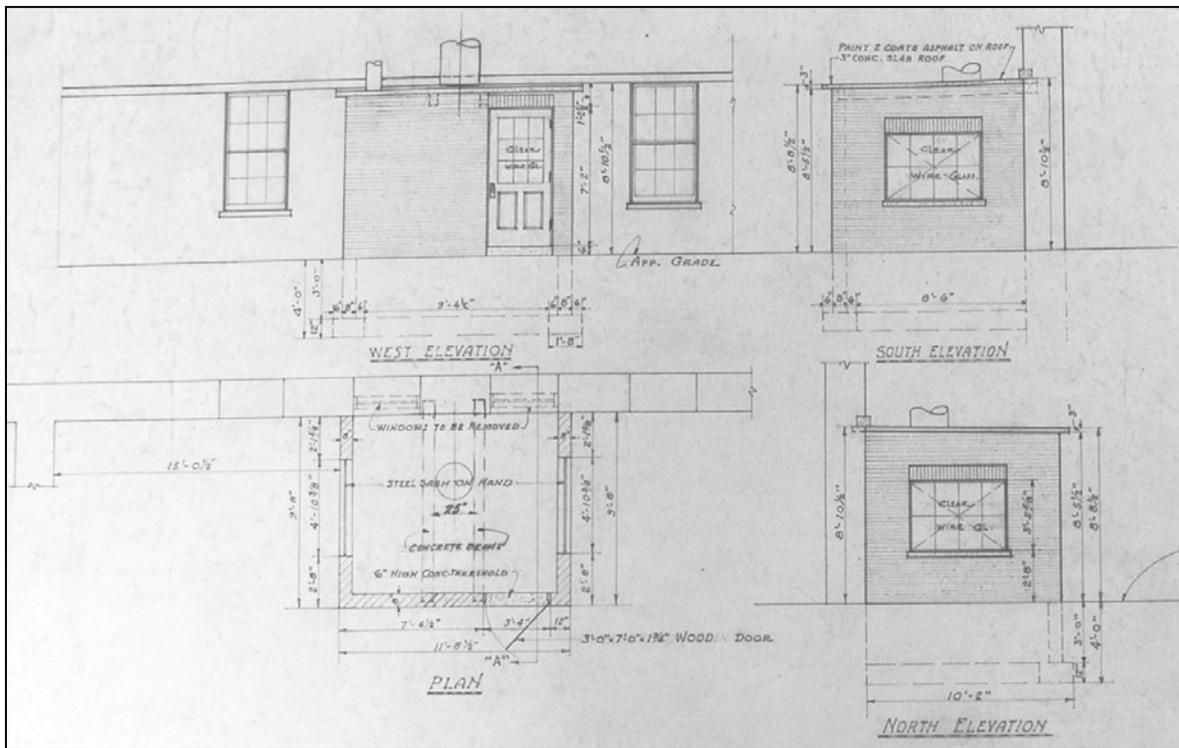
Building for Exhaust Fan, West of Building No. 27, Hill Shops, Springfield Armory U.S.A., April 10, 1942; plan detail, not to scale.
